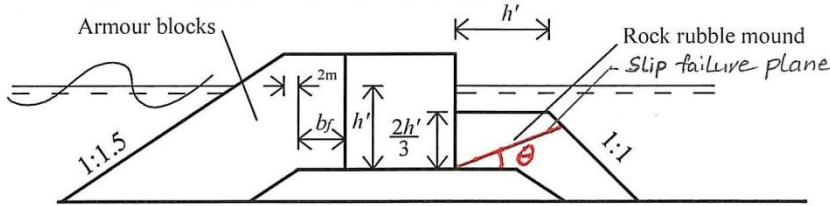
Armour blocks in front of caisson and rubble mound behind caisson as means of repair.
